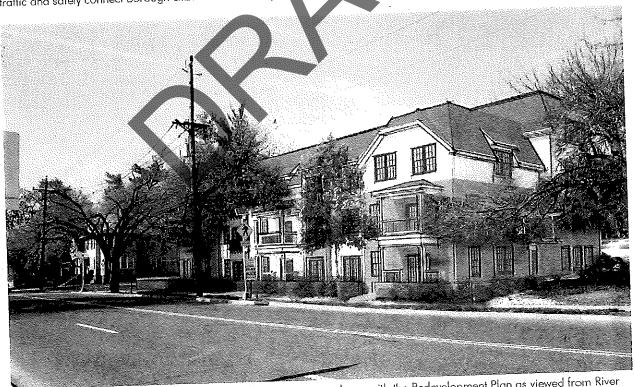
Rendering of potential massing and character in accordance with the Redevelopment Plan as viewed from River Road; note the use of low-walled terraces and balconies to enhance livability along a busy road and take advantage of river views
